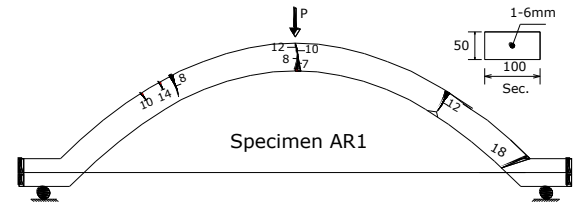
Cracking behavior of reinforced concrete arch AR1
